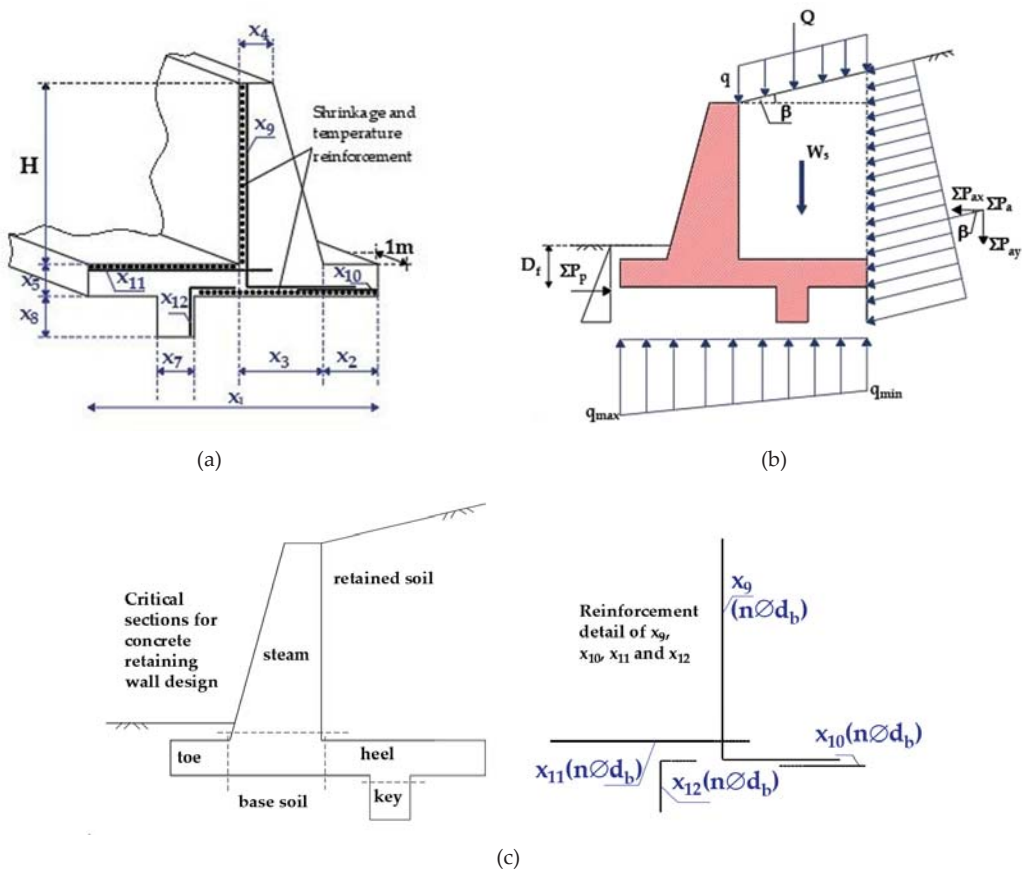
Reinforced concrete cantilever retaining wall design (RCRW): (a) Design variables; (b) Acting loads on retaining wall; (c) Design details.
